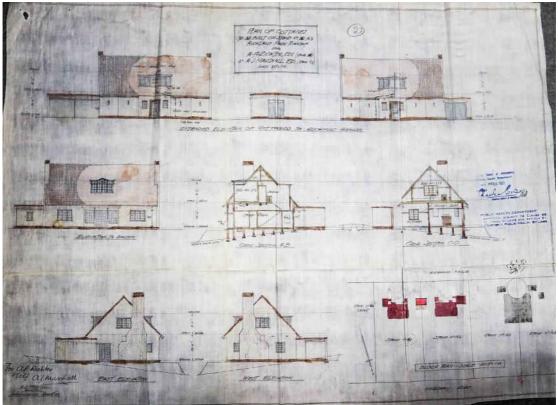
Plan of Cottages to be built on Stand 161 & 162 for A.P. Richter in 1923 (Source: City Council of Johannesburg, Plans Archive)
